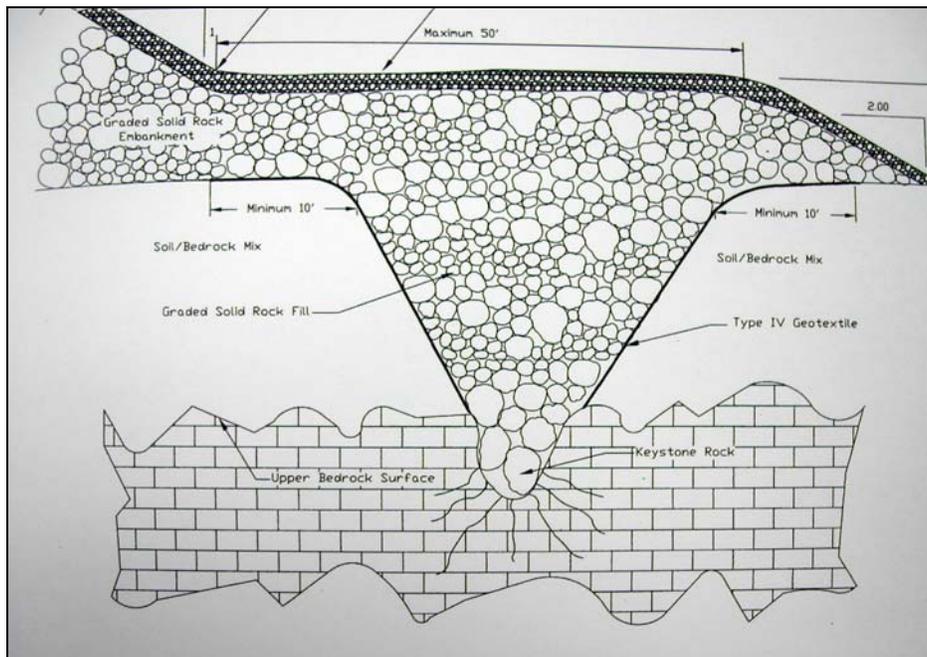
Treatment concept for filtering runoff into sinkhole adjacent to roadway embankment.
